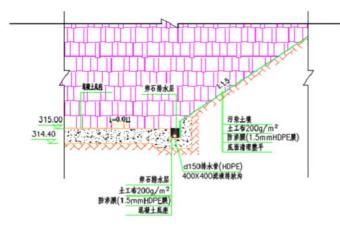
Anti-seepage System of the Contaminated Soil Storage Facility
